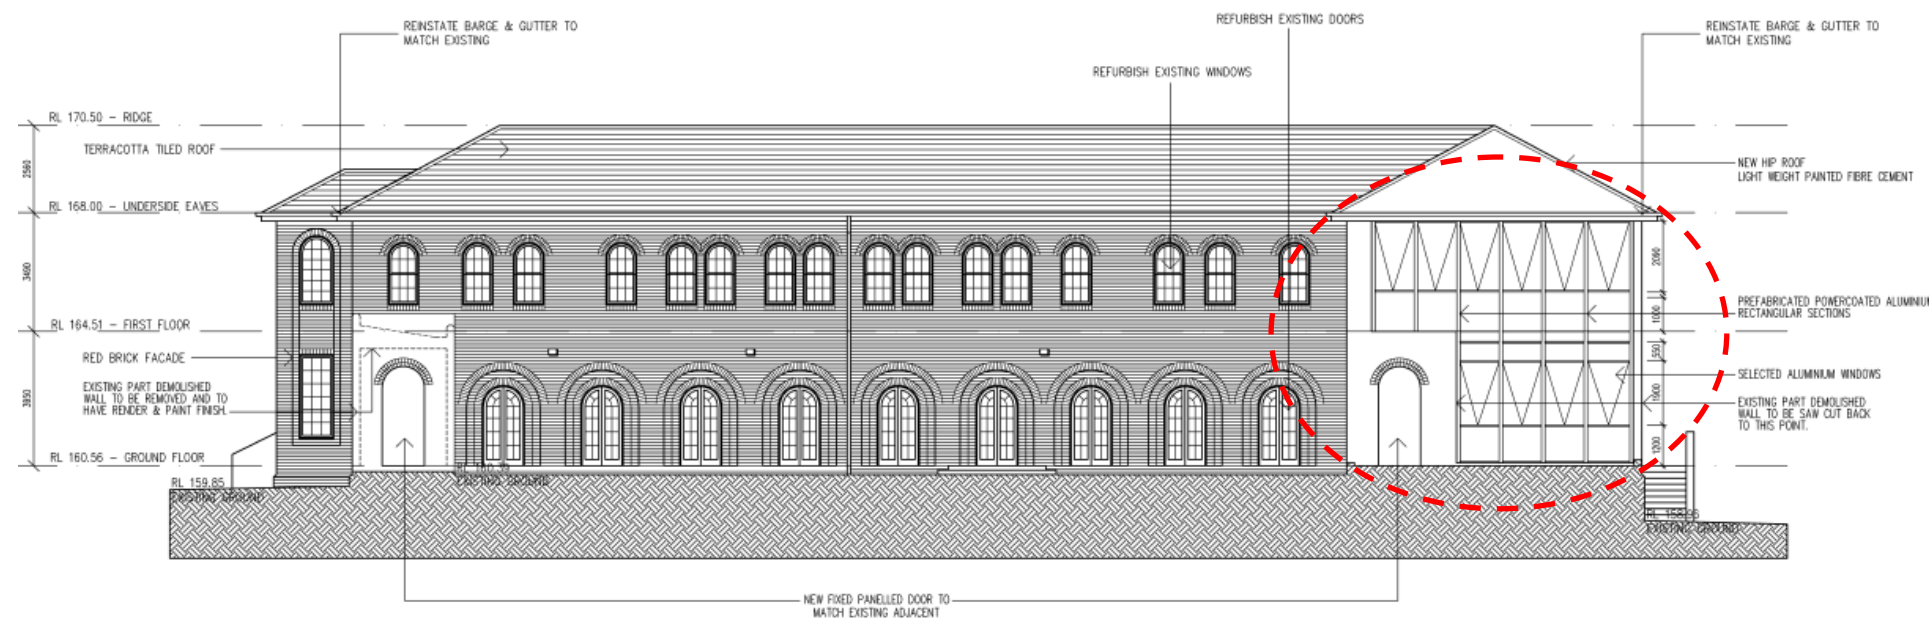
Proposed southern elevation of the Monastery building. As indicated in red, this elevation shows the full-length windows on both levels which replace the portion of the building which adjoined a previously demolished part of the building.
